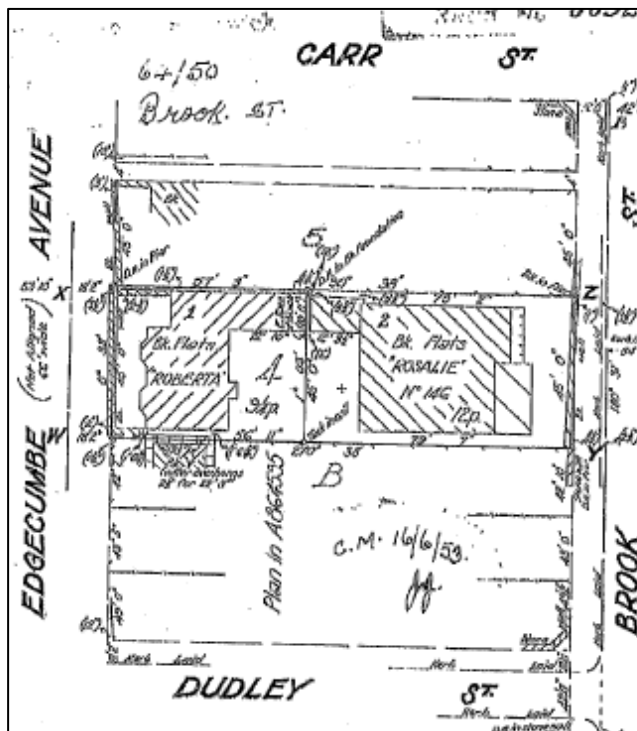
Subdivision Plan of 146 Brook Street 1954. (Randwick City Council)
